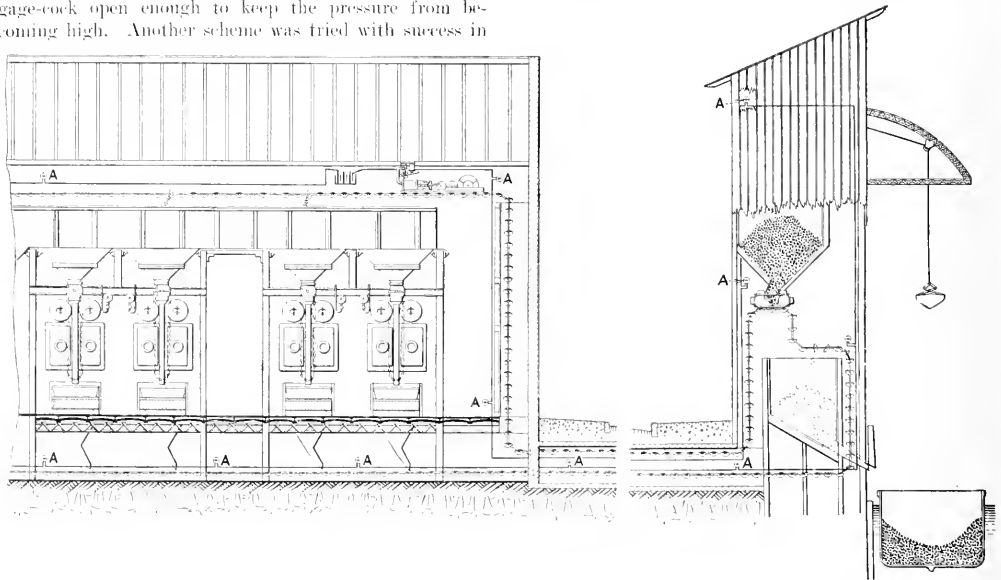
CONVEYOR SYSTEM, PUSH BUTTONS AND ELECTRICALLY OPERATED VALVE
